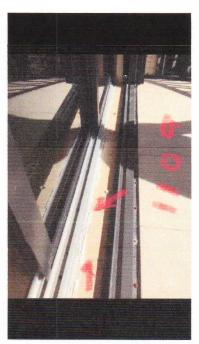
Exterior sealant past its serviceable lifespan at sealant between the window/door frames and masonry/concrete walls & balcony floors
